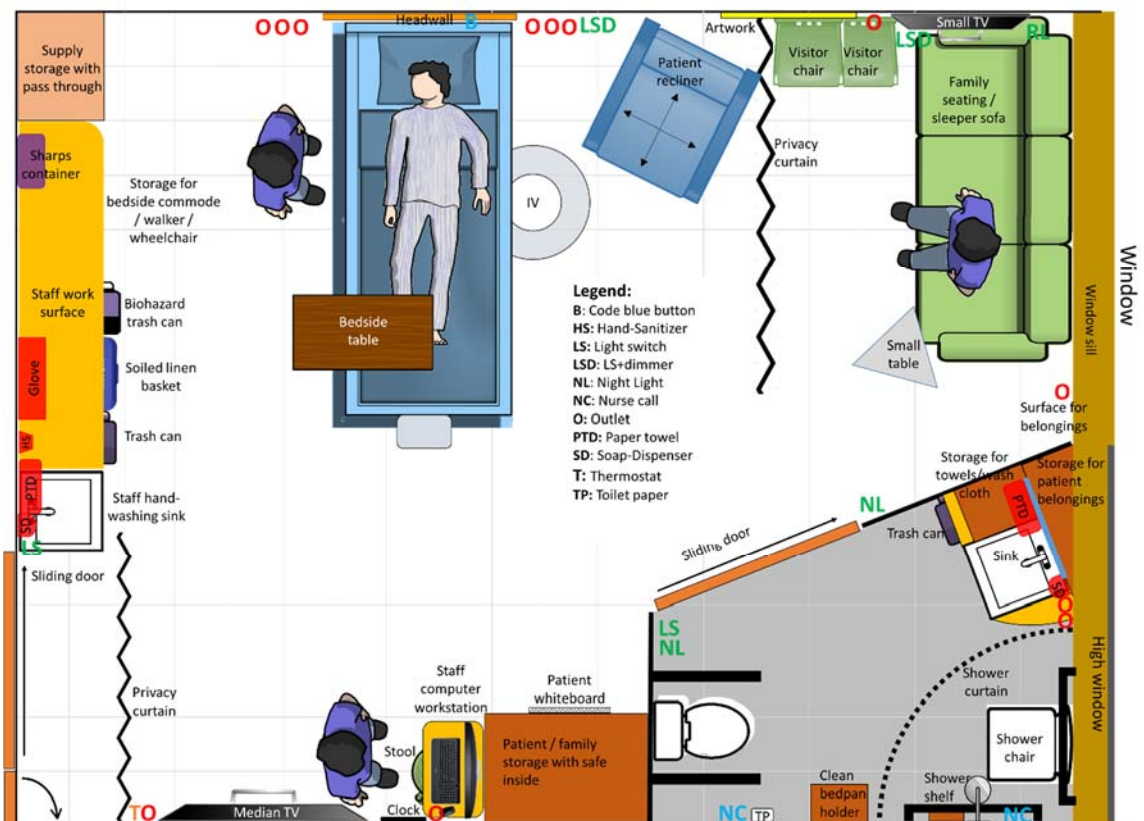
Hybrid layout where the bed is offset from corner door with outboard bathroom.
